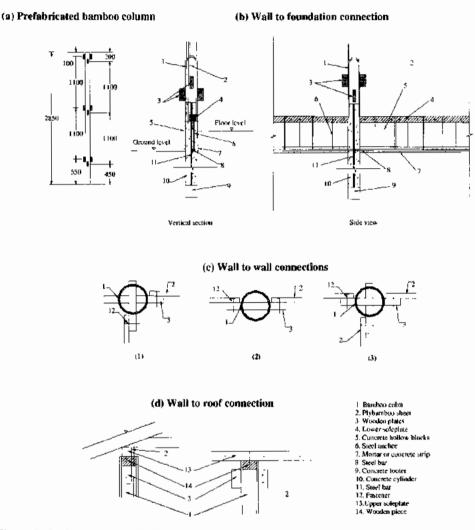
Design method C. Wall and connection details. Dimensions in mm.
